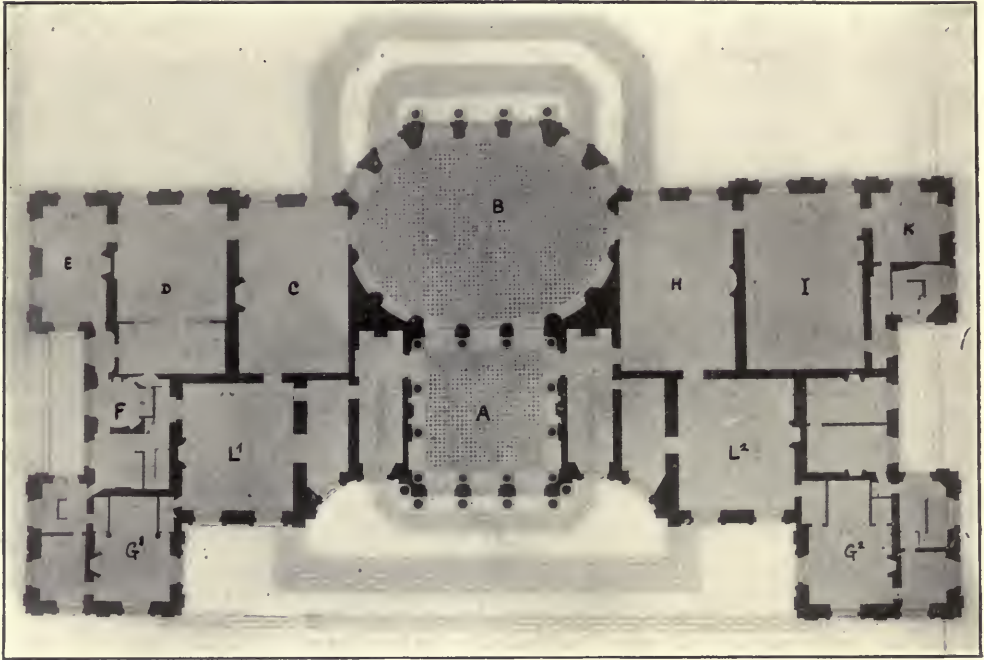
PLAN OF THE GROUND FLOOR OF THE CHATEAU OF VAUX.
